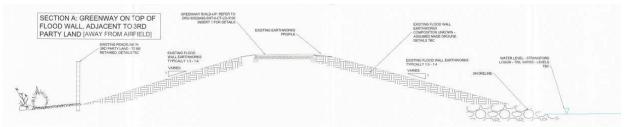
section plan of the proposed greenway along the existing path at the top of the flood wall. Drawing 59B.
